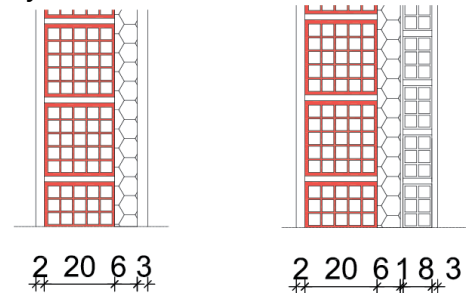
Possible interventions in the façade with hollow brick walls, by adding a layer of thermal insulation only, or a layer of thermal insulation plus a layer of external perforated bricks to improve thermal insulation of the external wall
